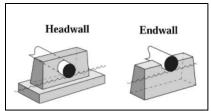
Headwall/Endwall (Outlet Erosion Control Structures, n.d.)
